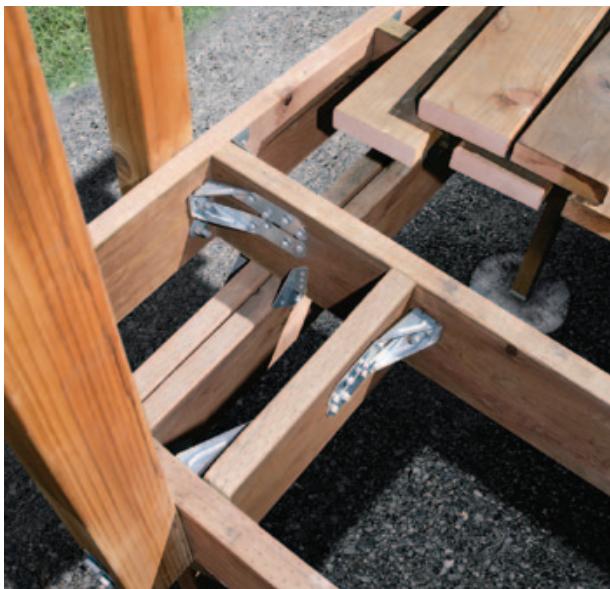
Hangers for stairs affix to the deck framing first and then to the stringer.
